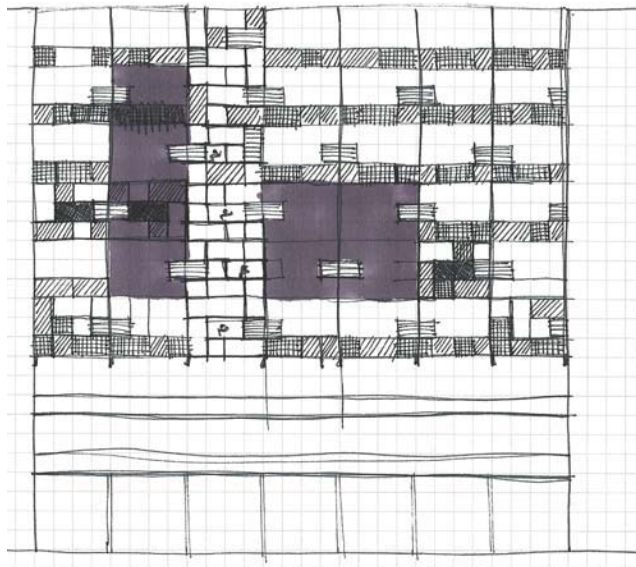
The southern façade of the Woltemade building indicating where [re]cesses occur behind the truss structure
